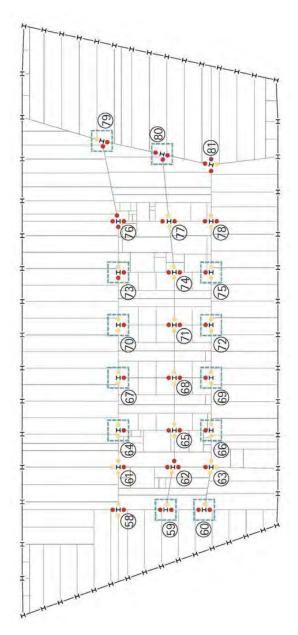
Typical WTC7 floor framing plan (red dots indicate knife connections which are vulnerable in tension; yellow dots indicate seated or header connections; blue boxes indicate interior columns with three-sided bracing)
